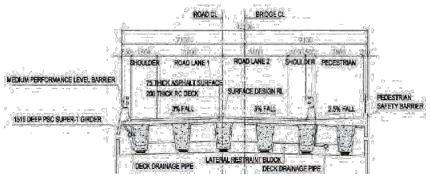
Superstructure Option 1 – Cross section with Super-T beams on Road B
